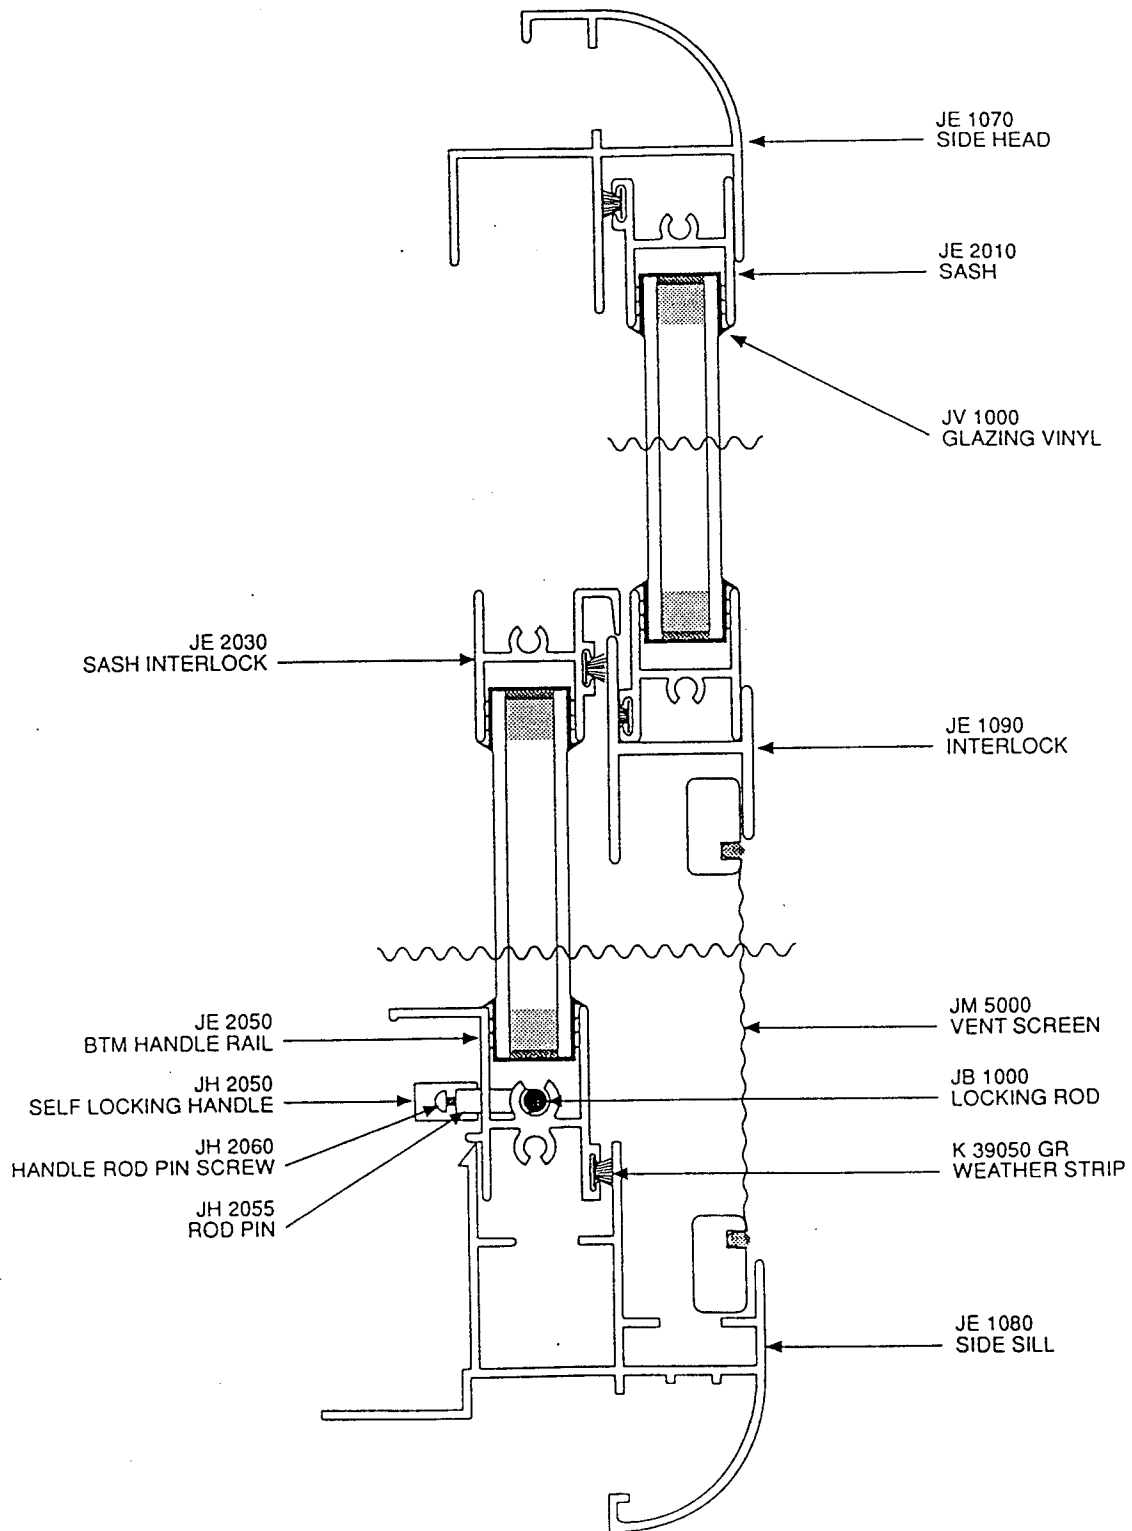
Vertical Cross-Section of Greenhouse Window
